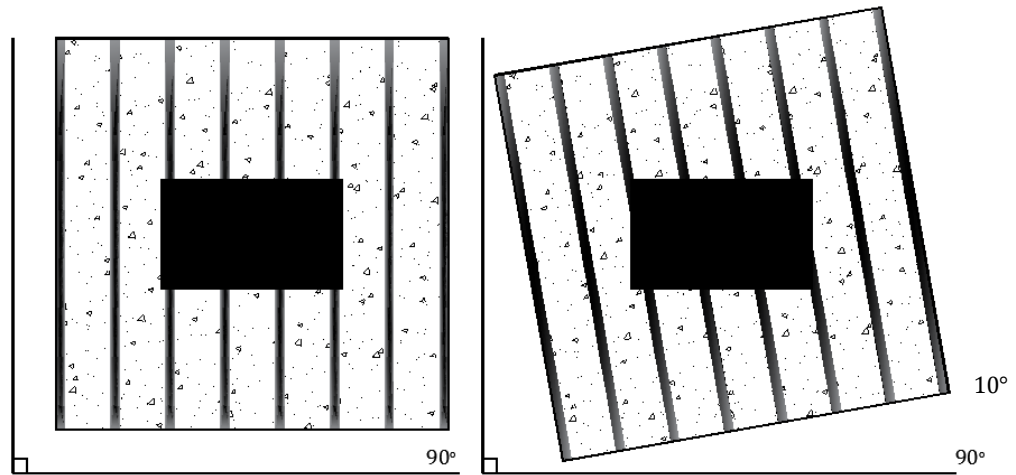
Plan view Schematic of the British Pendulum rubber slider interacting with Grooved Marshall Asphalt test specimen at 90° and 10°.
